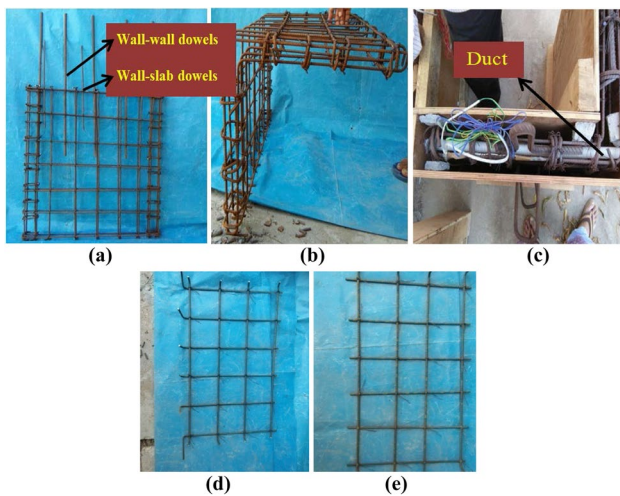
Bar bending. a Reinforcement cage of shear wall–lower panel. b Reinforcement cage of shear wall–upper panel. c Provision of duct in upper panel for the dowel bars. d Reinforcement cage of precast slab. e Reinforcement cage of structural topping
